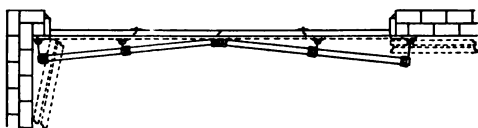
FLOOR PLAN, FOUR DOOR OUTFIT
